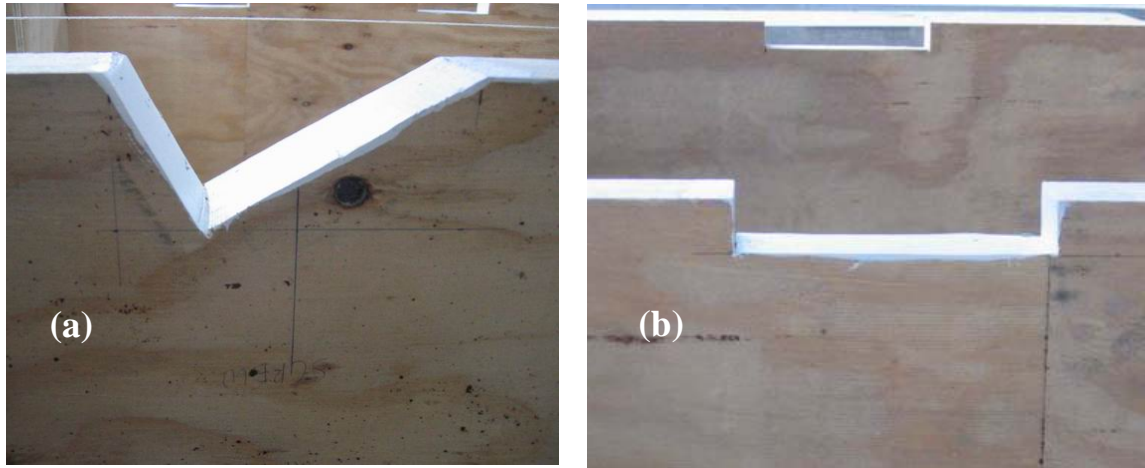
(a) Triangular notched cut in beam C2; (b) 150 mm rectangular notched cut in beams B1 and B2 (in the background)
